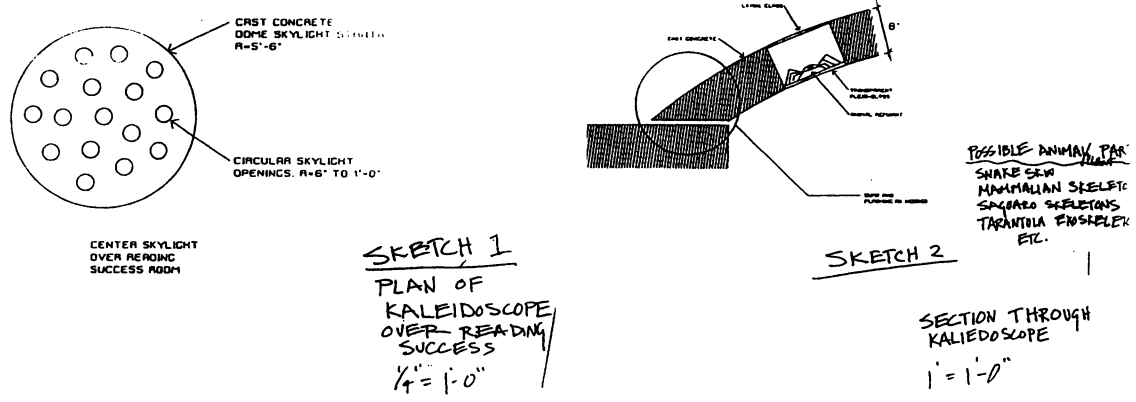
Ventana Vista Elementary School. Kaleidoscope plan and section: sketches by Predock
